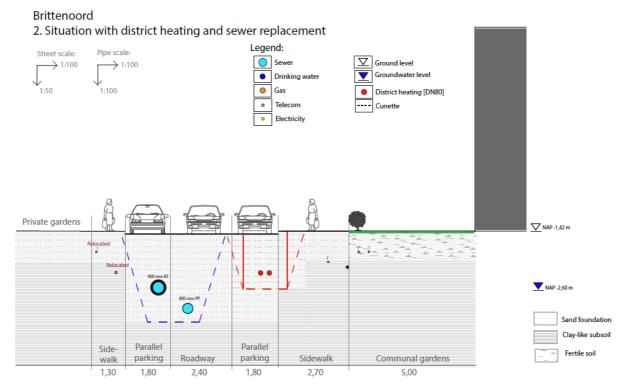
Cross-sectional view of Brittenoord – Situation 2: situation with district heating and sewer replacement
